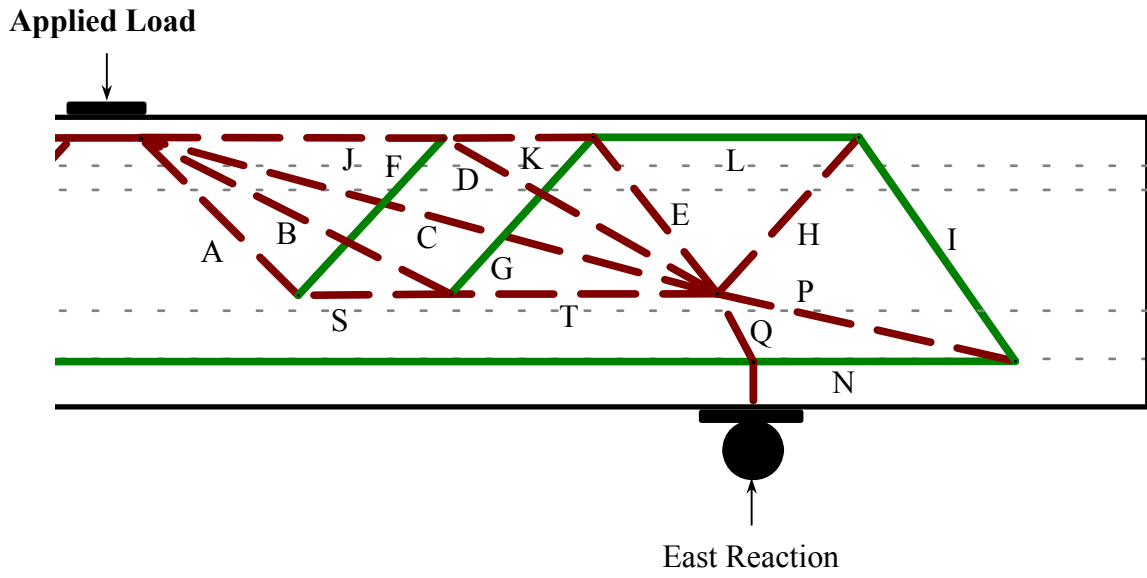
Illustration. Truss model for failure of Girder 28S.
